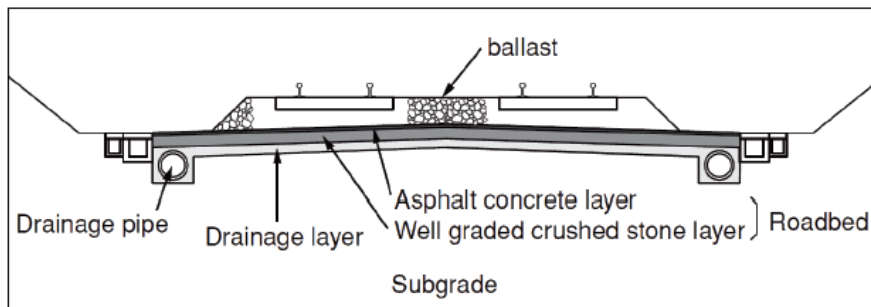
Cross section of ballasted track and asphalt roadbed [10.]
